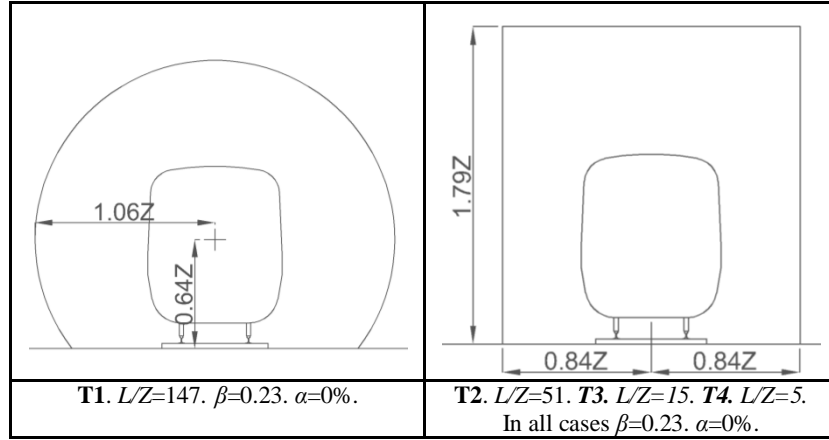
Cross-section views and geometric details of the tunnel test cases (recap).
